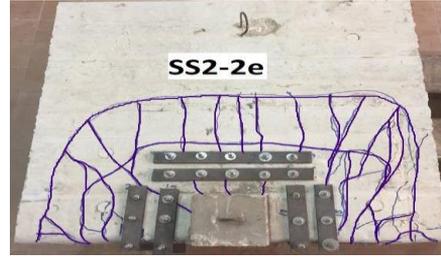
Pattern of cracking for specimen (SS2-2e).
